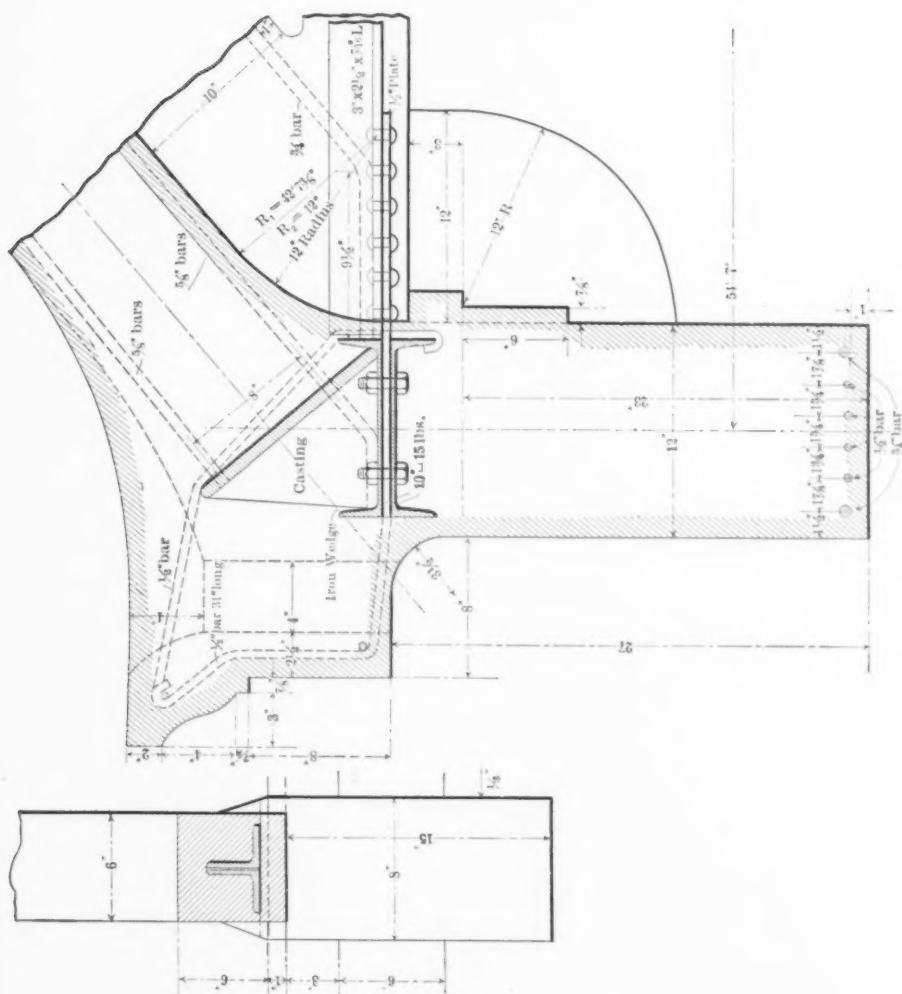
DETAIL OF ROOF CONSTRUCTION.
